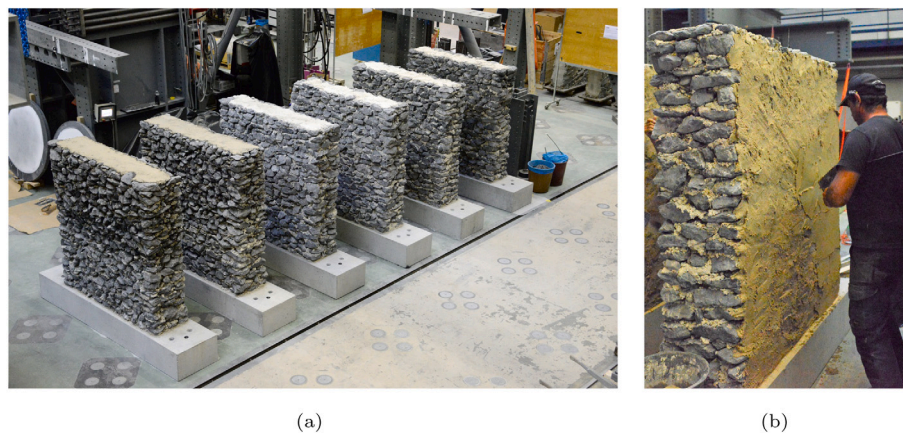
(a) Constructed rubble stone masonry walls; (b) application of plaster layers.
